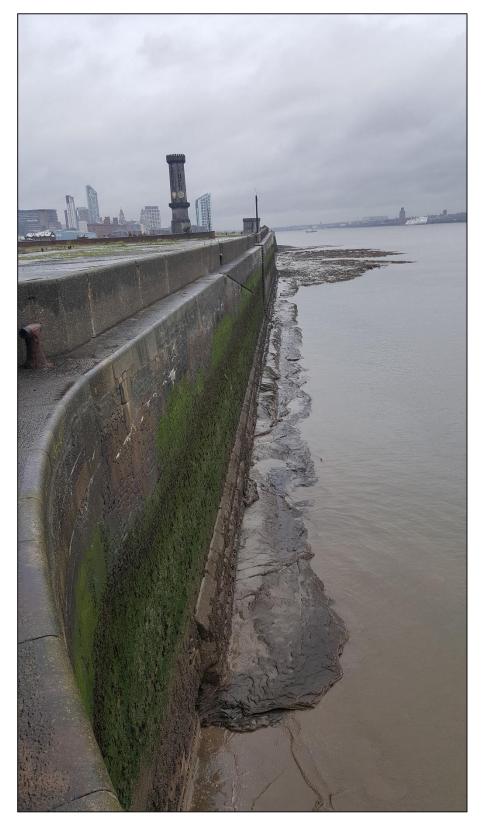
River Mersey dock wall, taken from western wharf. (Note should be made that the River Mersey Dock Wall is outside of the application red line)
